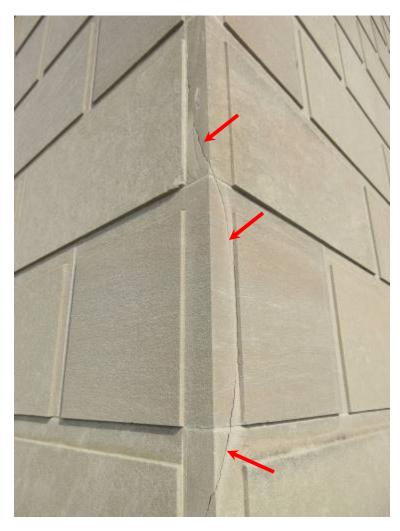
Cracked stones at the seventh floor at the southeast corner.
